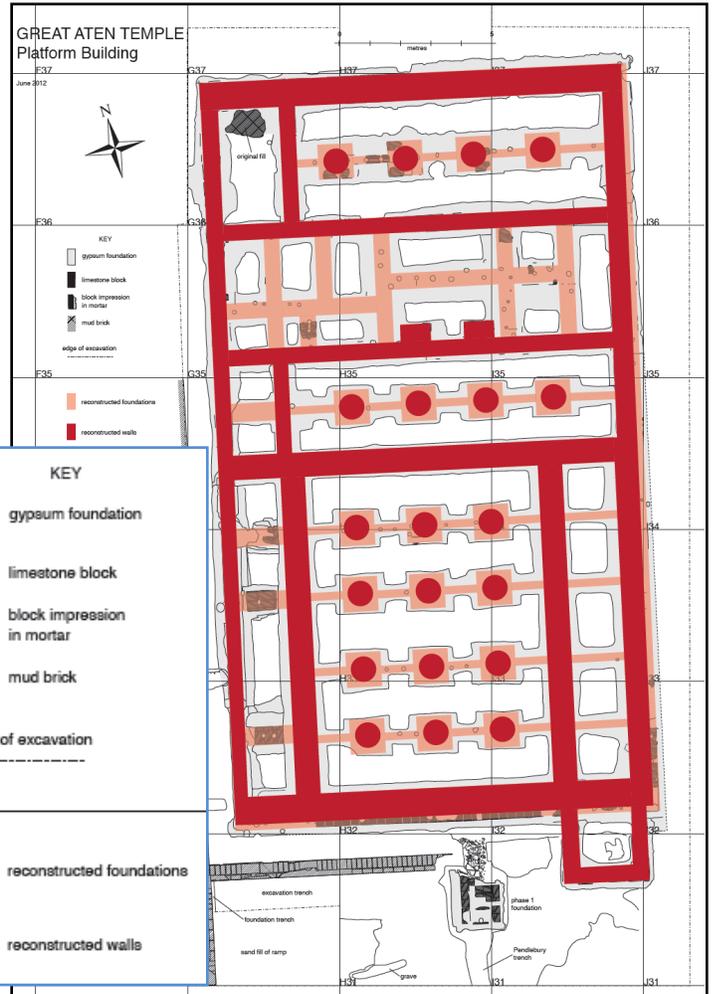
Plan of the same building to which have been added reconstructions of the foundation layer of stone blocks and of the walls and column bases that stood on them.
